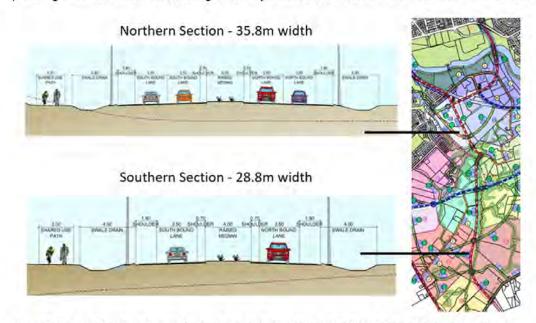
Cross Sections for north-south arterial from Southern Links Scheme Assessment Report Drawings
